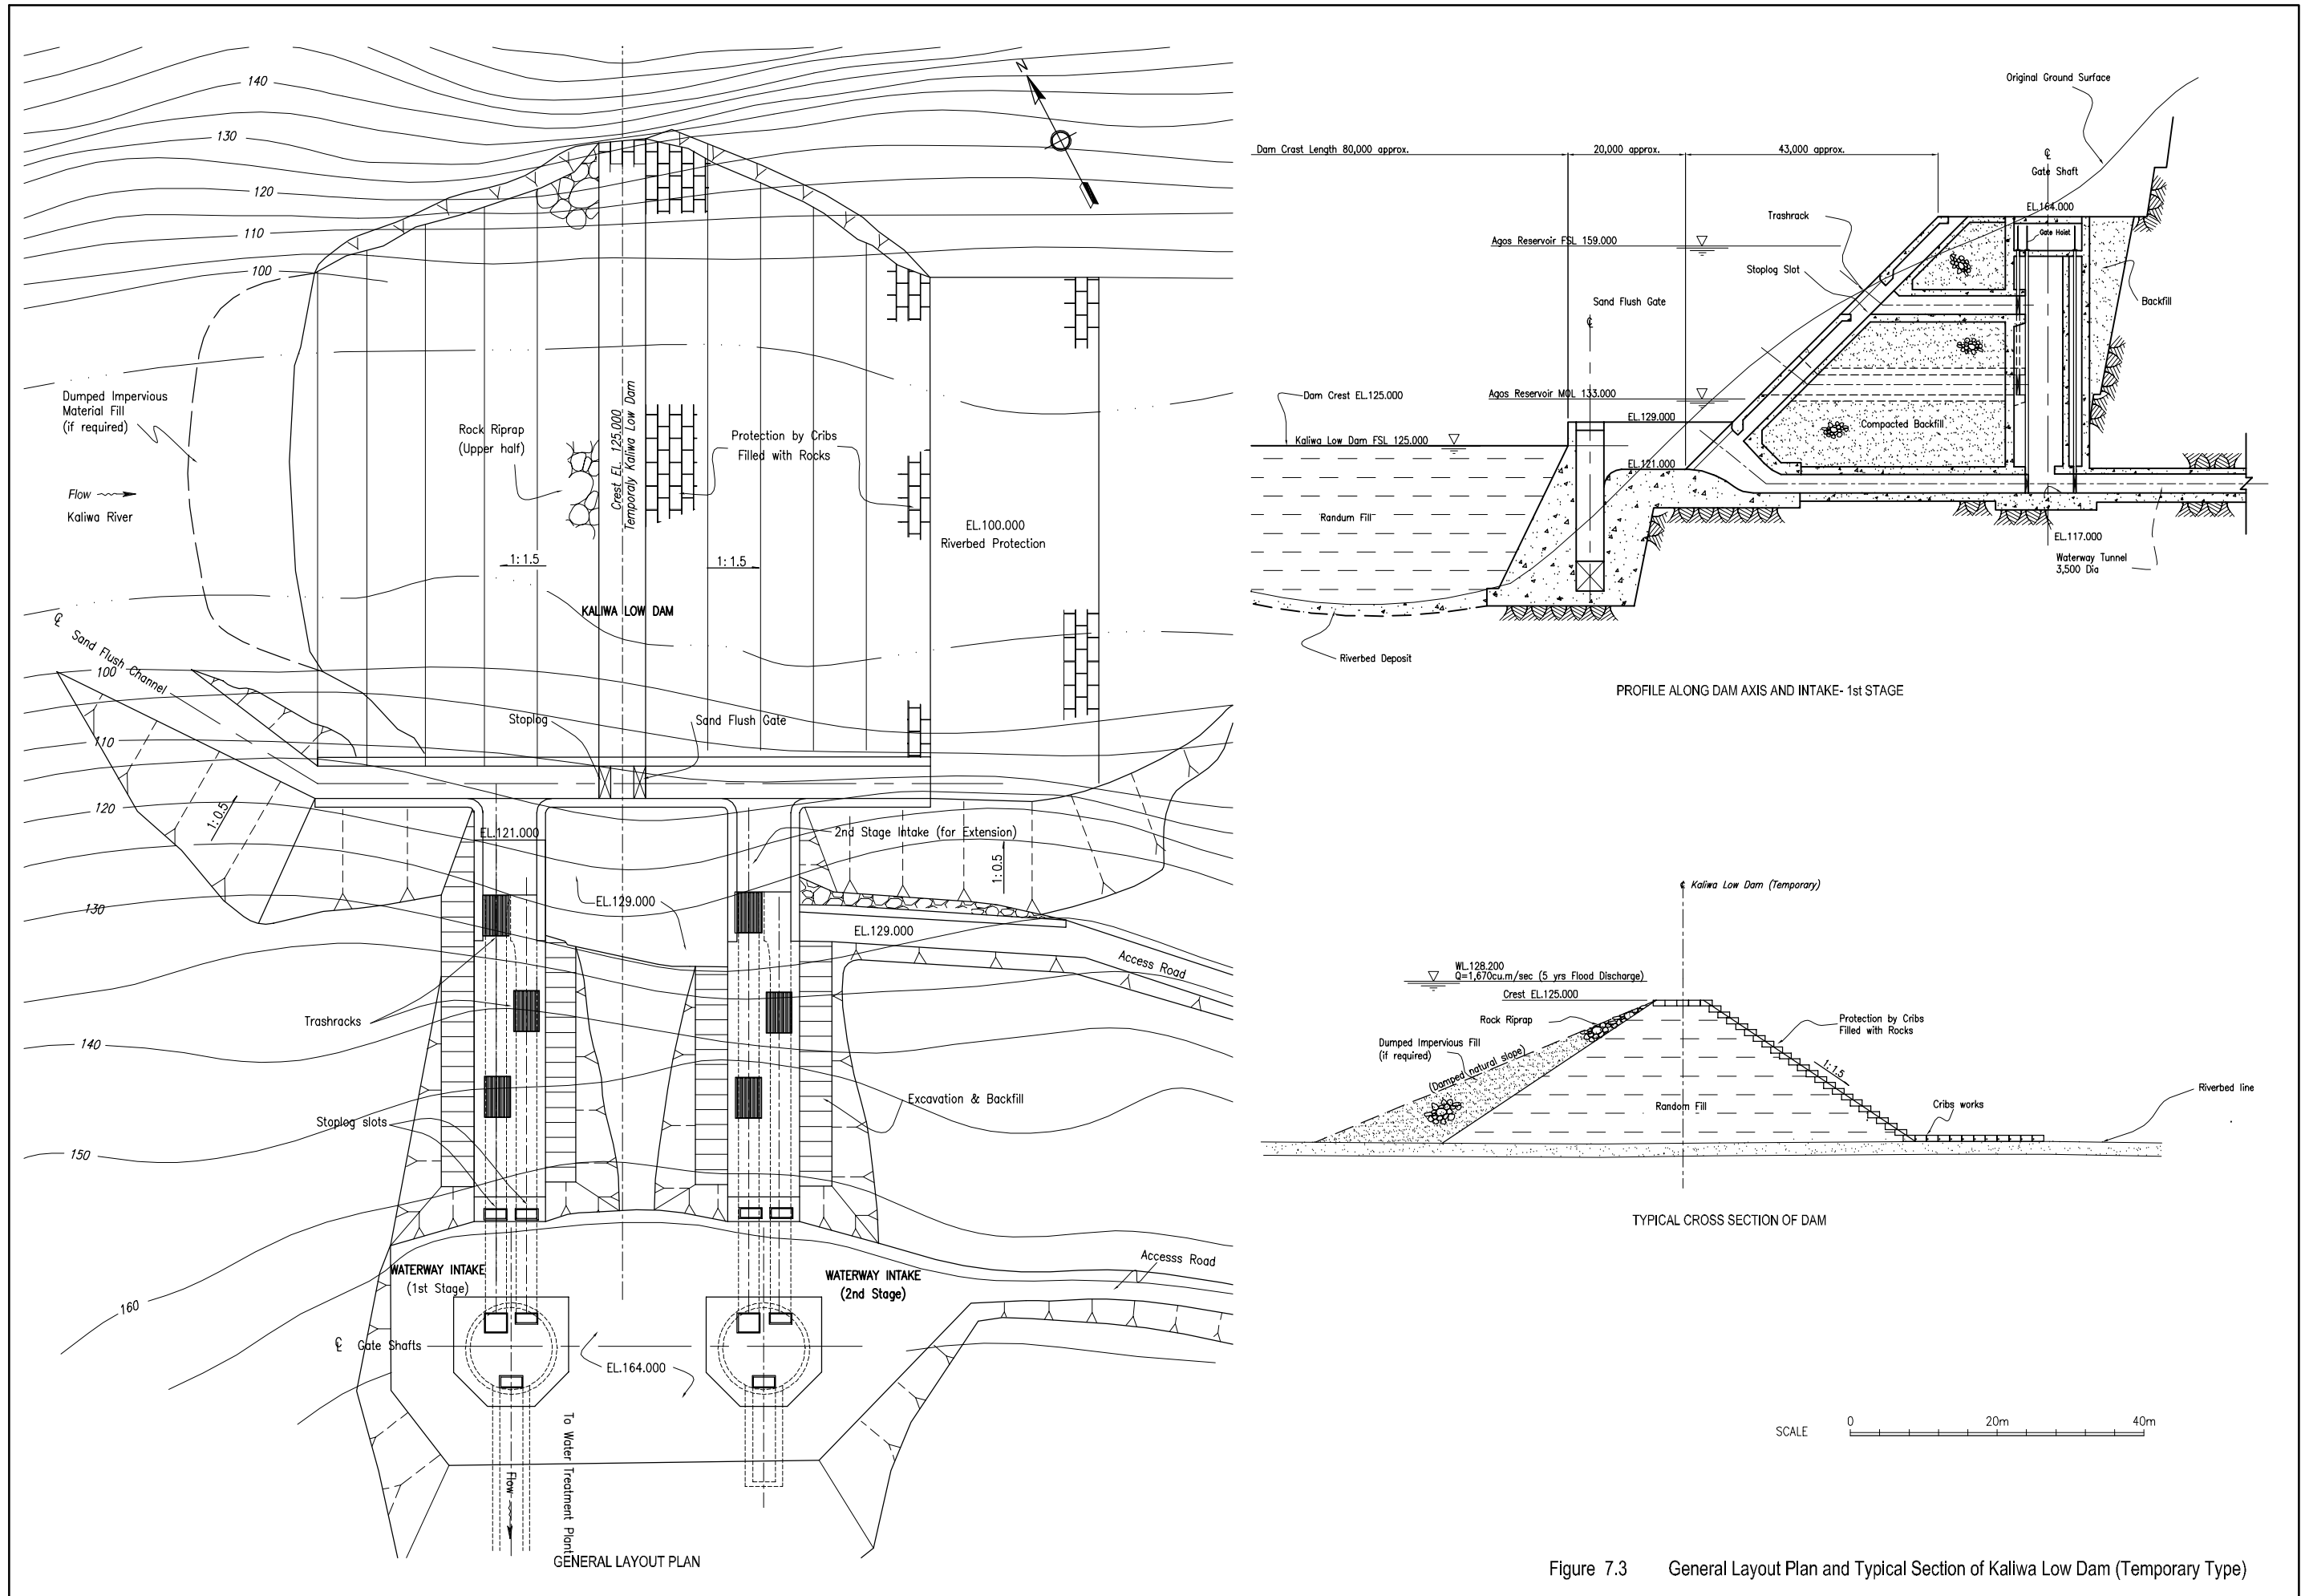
General Layout Plan and Typical Section of Kaliwa Low Dam (Temporary Type)
